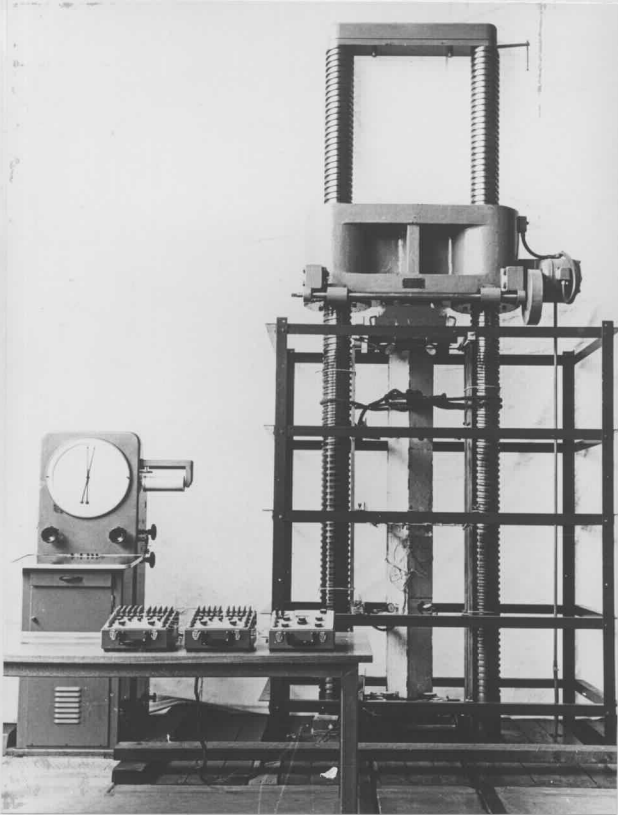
PLATE IX TEST ARRANGEMENT FOR COLUMNS
